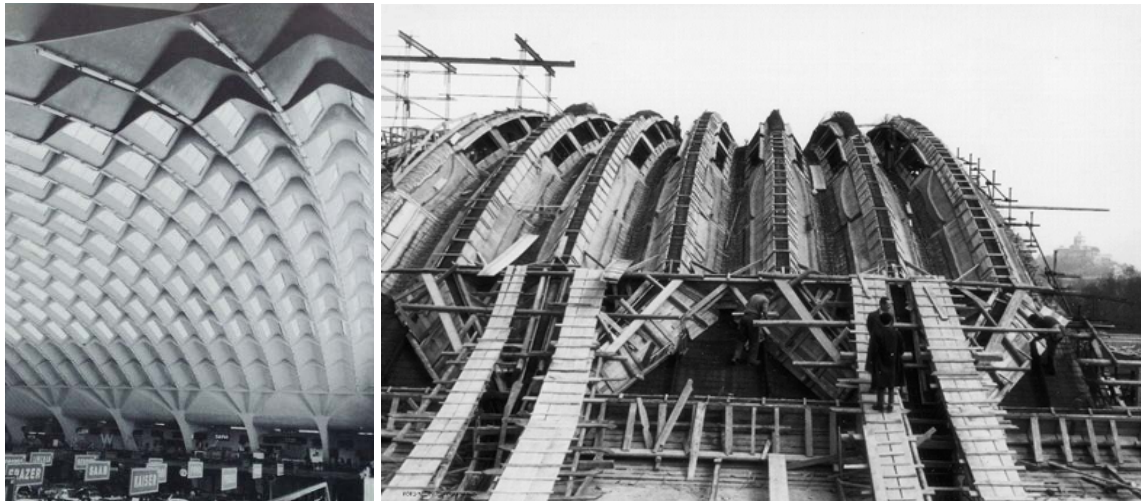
(left) The internal precast roof panels inset with glazing.
